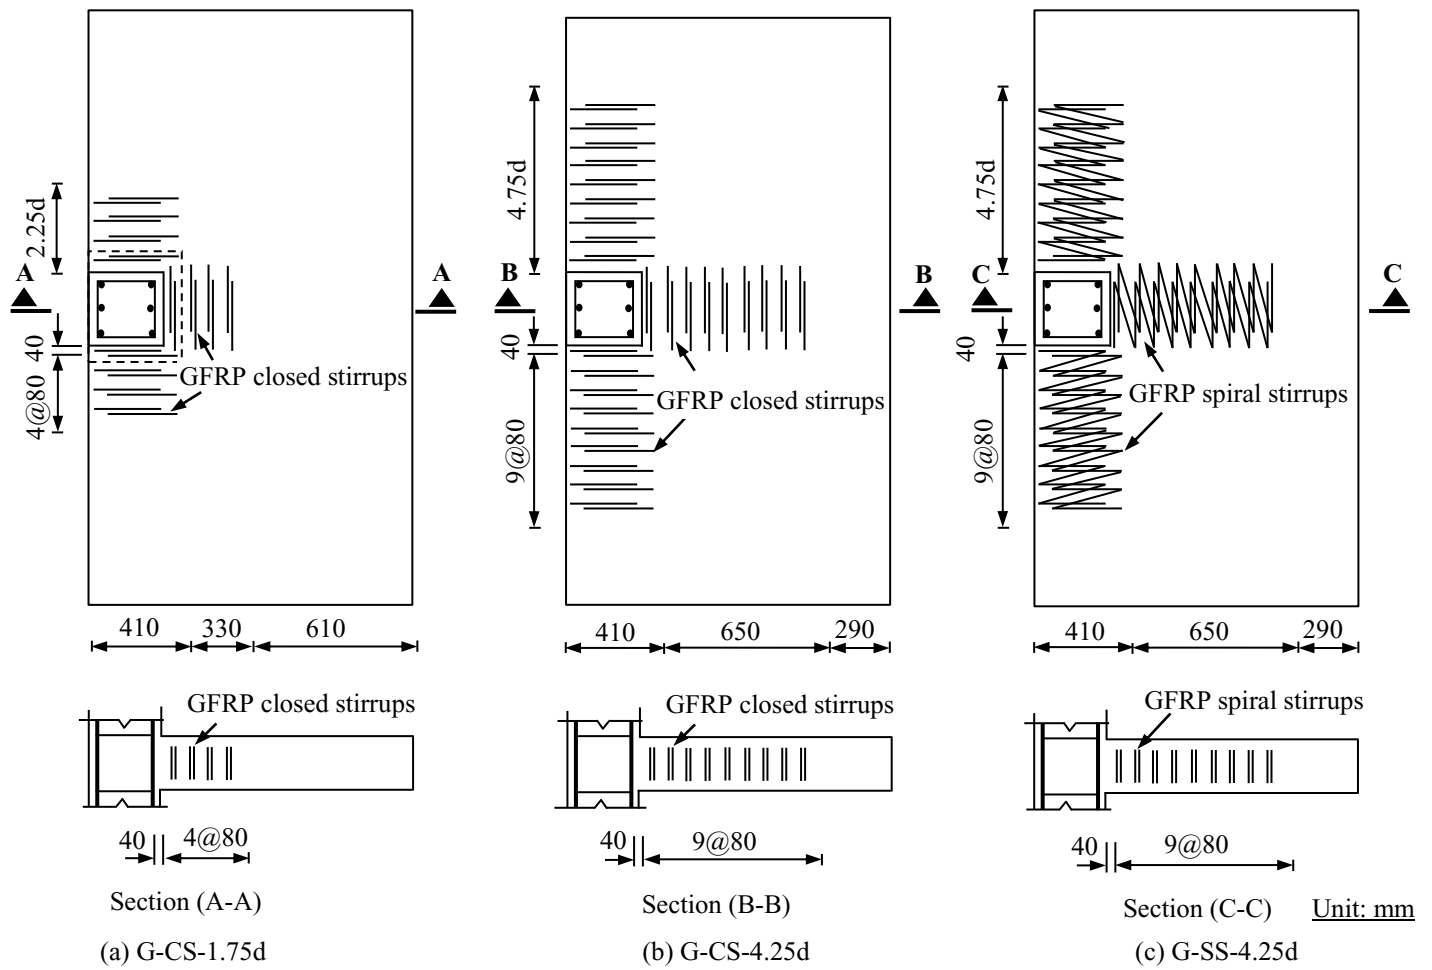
Arrangement of GFRP stirrups shear reinforcement
